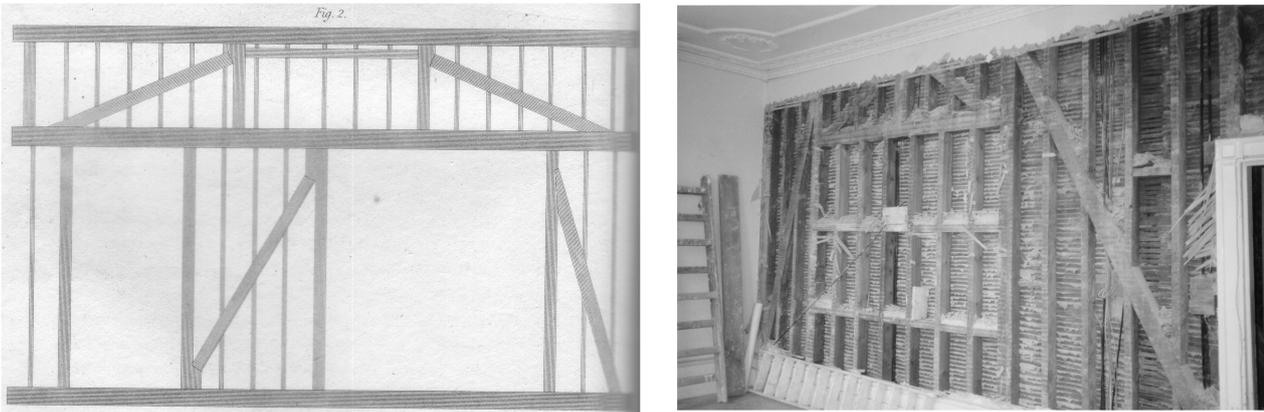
Trussed Timber Wall. Nicholson 1823 Plate XXIII (left). Park Square West Example (right).
